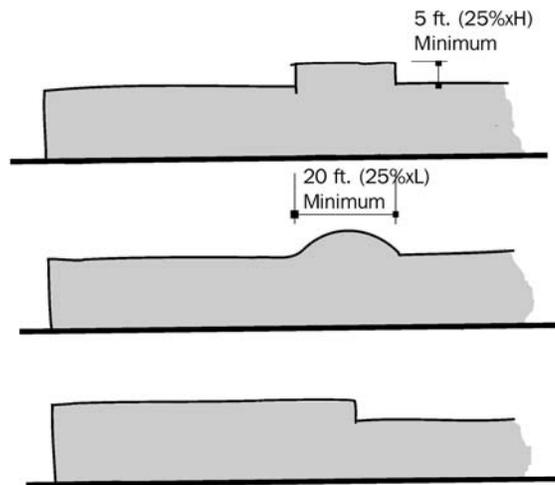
INDUSTRIAL BUILDING ARTICULATION EXAMPLE
